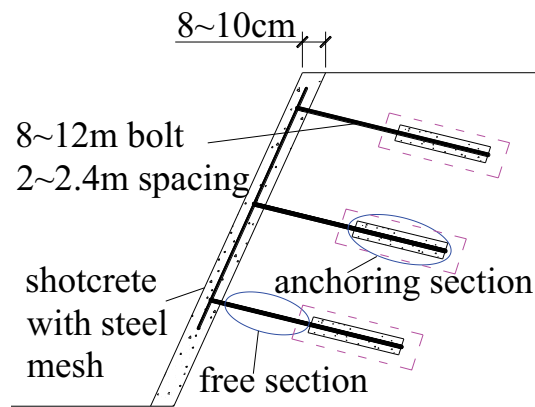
Reinforcement principle sketch of shotcrete with bolts
